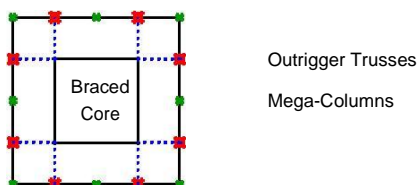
Simplified structural plan of the 60-story building of outrigger structure.
